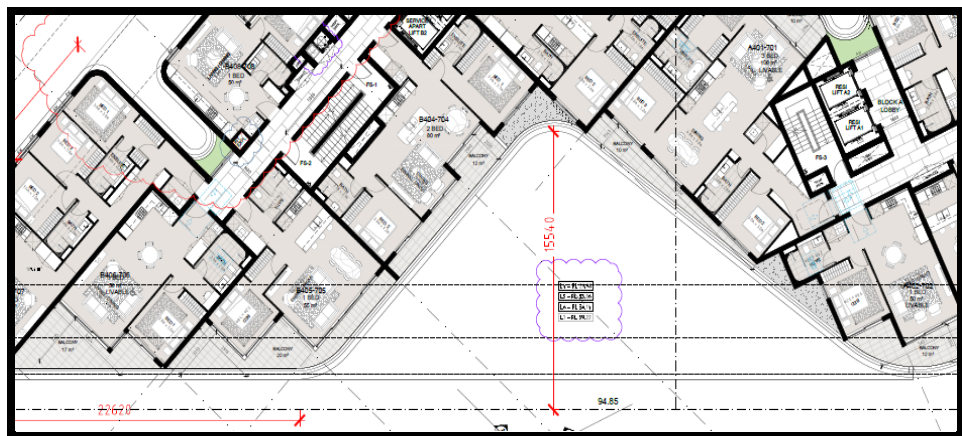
Plan showing the setbacks to the Princes Highway from the levels above the podium.
